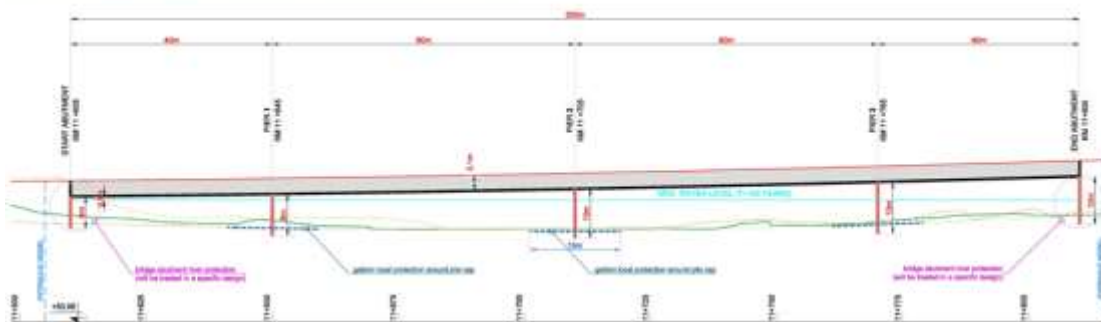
Longitudinal section of Alternative 'C' for bridge 05 (40+60+60+40m)
